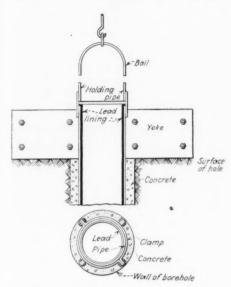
Lead-Lined Steel Pipe With Supporting and Aligning Clamps and Bail for Lifting.
